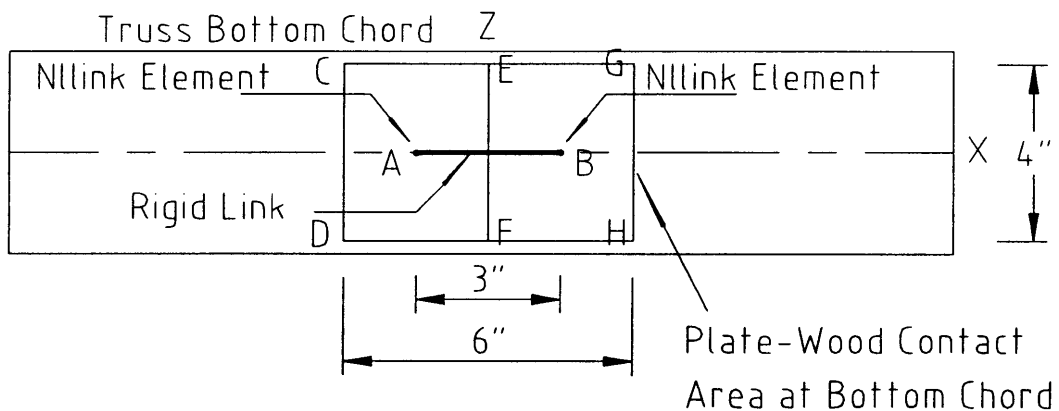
Bottom-Chord-Tension-Splice Joint Detail for the Truss Type ASGR
